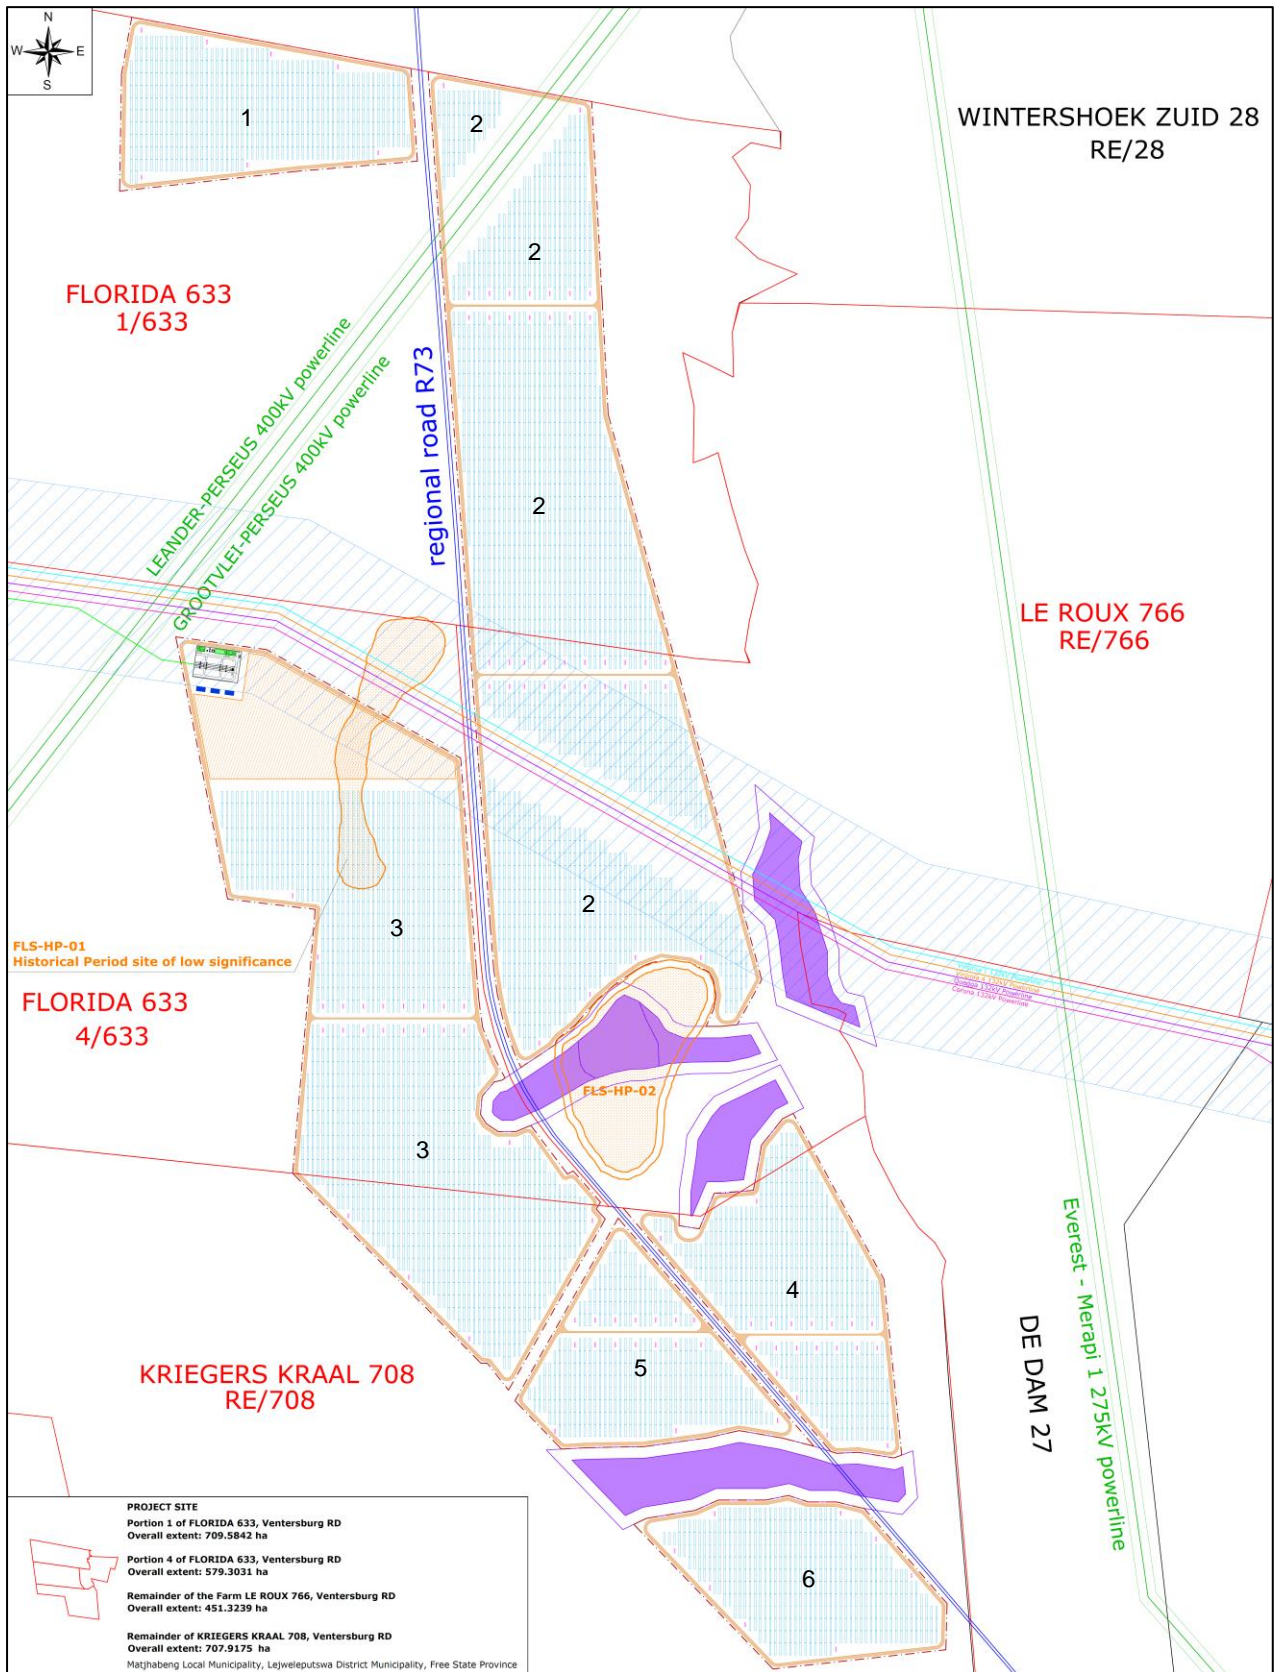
Proposed Layout Plan of the Florida Solar PV facility
